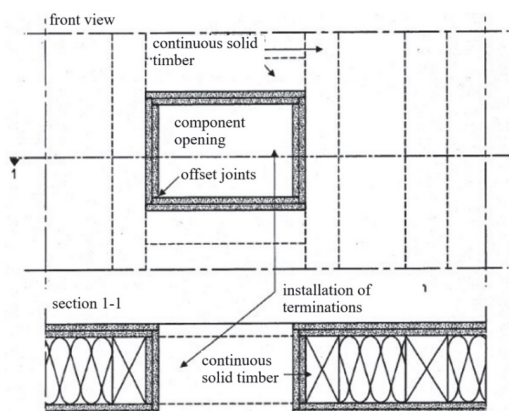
Opening in the building element with fire protection cladding for the installation of doors, windows and other fittings (top image: elevation view, bottom image: horizontal section)
